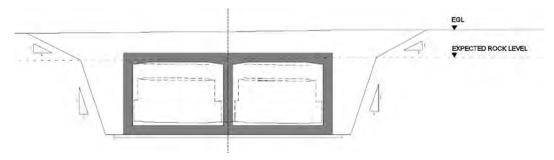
In-situ Reinforced Concrete Box Typical Cross-Section
